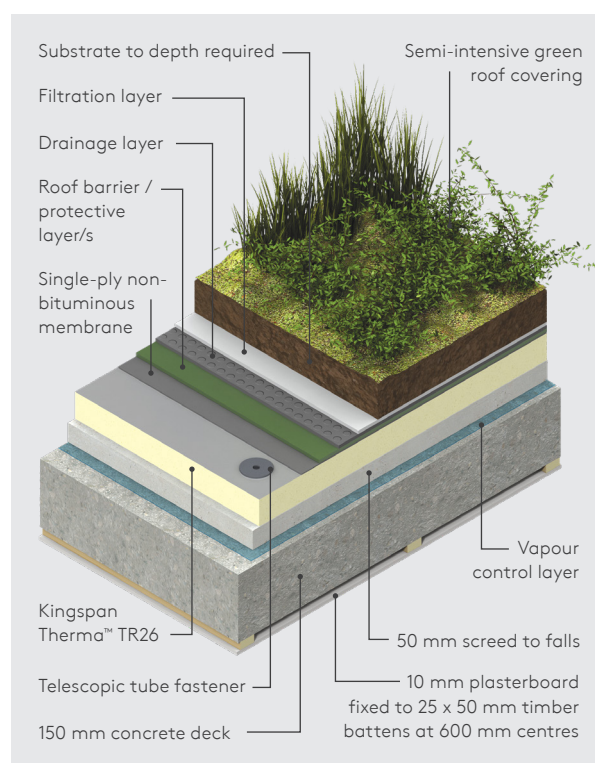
Kingspan Therma™ TR26 in a Semi-Intensive Green Roof Covering – Dense Concrete Deck with Suspended Ceiling
